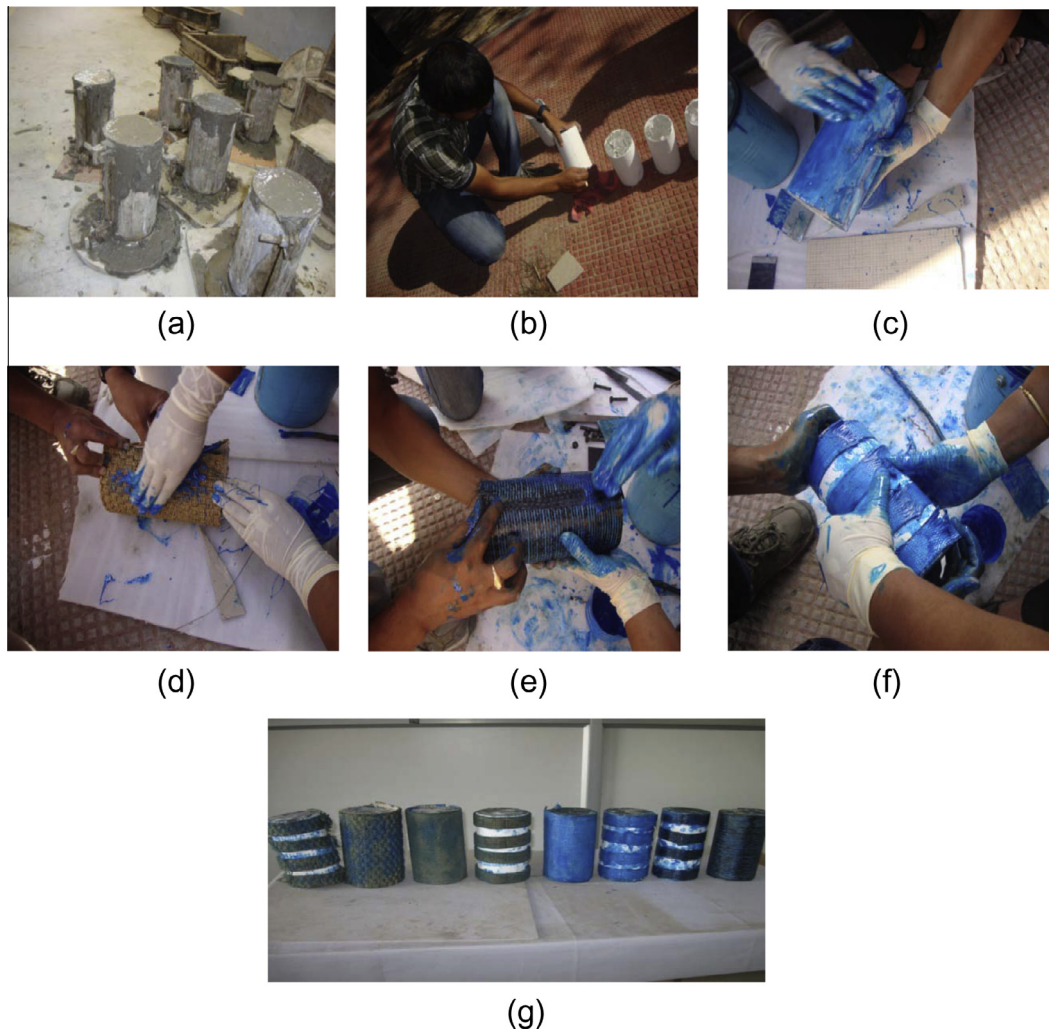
(a) Concrete cylinders after casting; (b) primer applied concrete cylinders being cleaned; (c) application of epoxy hardener mix on the concrete cylinder; (d) bonding of woven sisal fabric on the cylinder; (e) final coating of epoxy hardener mix on the bonded carbon fabric on the concrete cylinder; (f) final coating of epoxy hardener mix on the strip bonded glass fabric on the concrete cylinder; (g) all the FRP confined concrete cylinders before testing.
